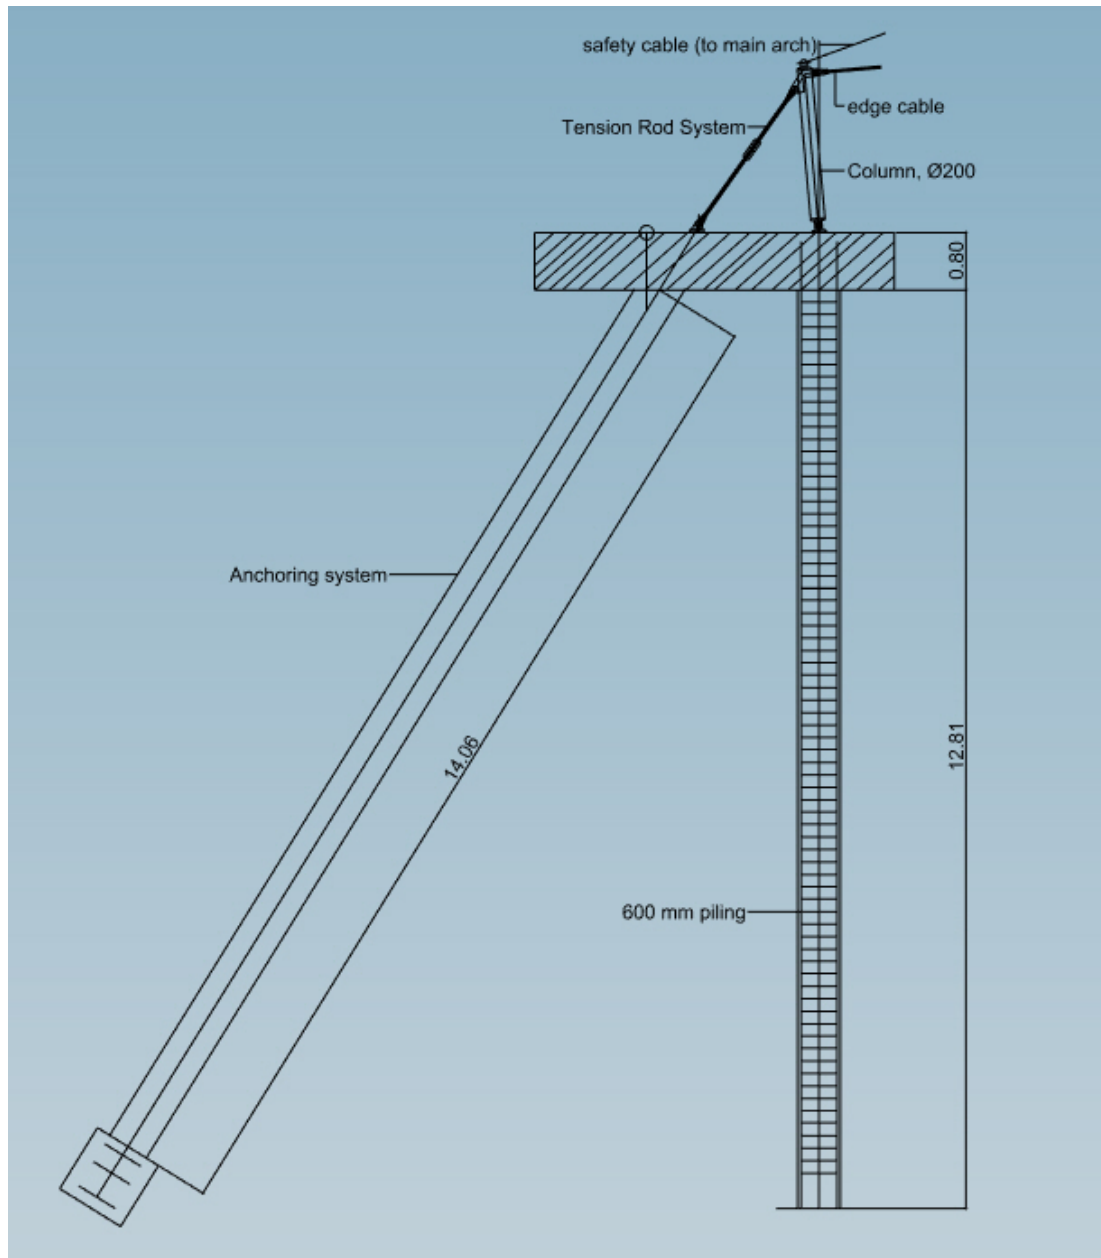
foundation anchor and piling at columns FC1, FC3, FC4, FC6
